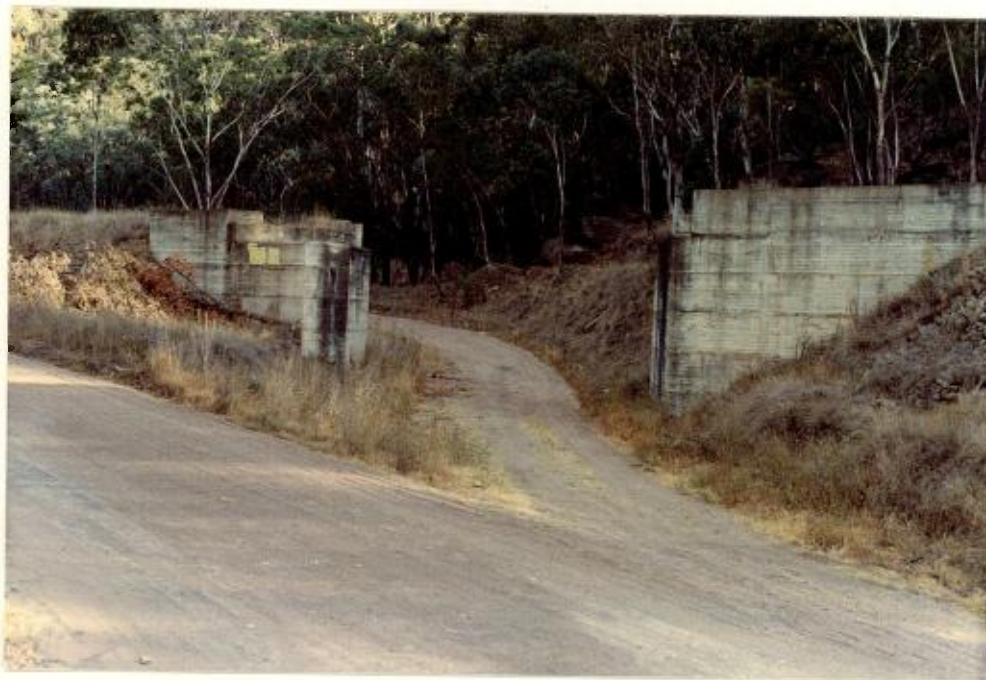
(6) Cox's Gap Road Crossing (Bridge No. 6)
